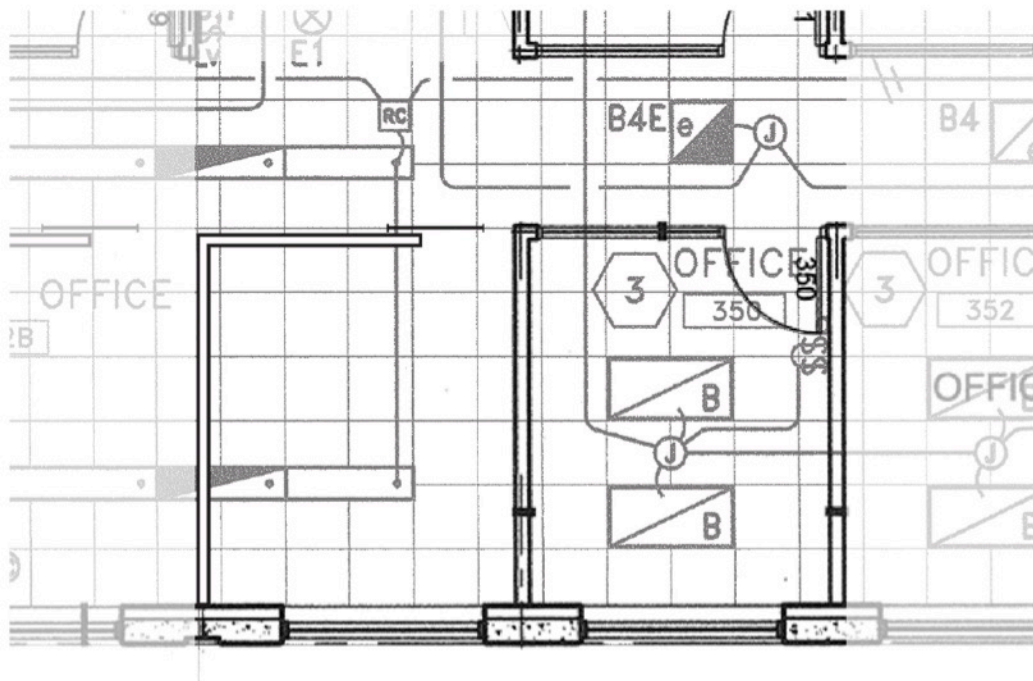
Typical floor plans for enclosed offices and open office cubicles.
